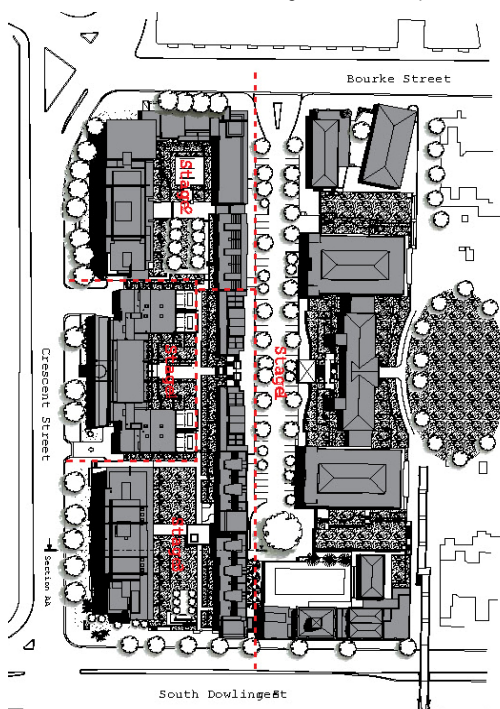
Moore Park Gardens Plan and Section 2.5:1 with its park courtesy AJ+C Architects
